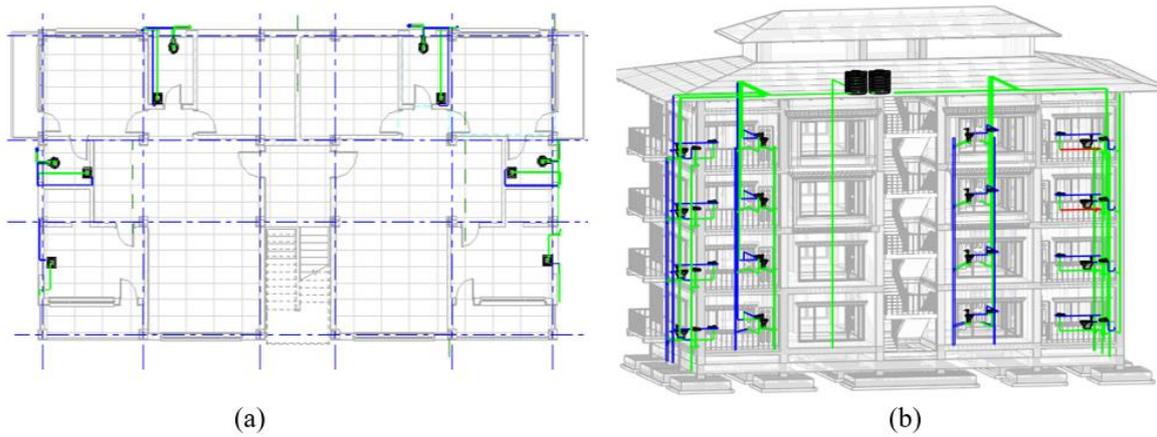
(a, b) Plumbing floor plan and 3D model
